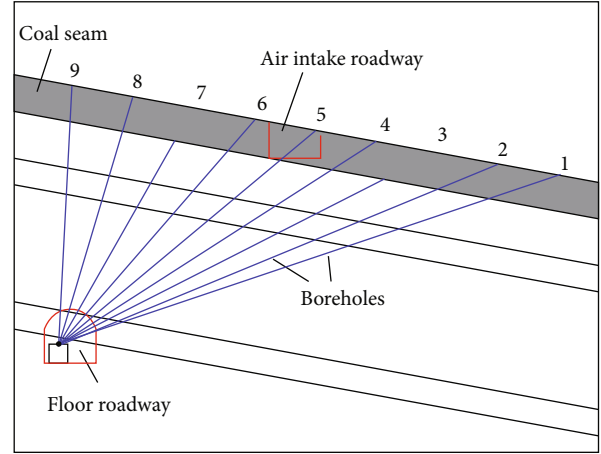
Section of gas extraction boreholes drilling from floor roadway.
